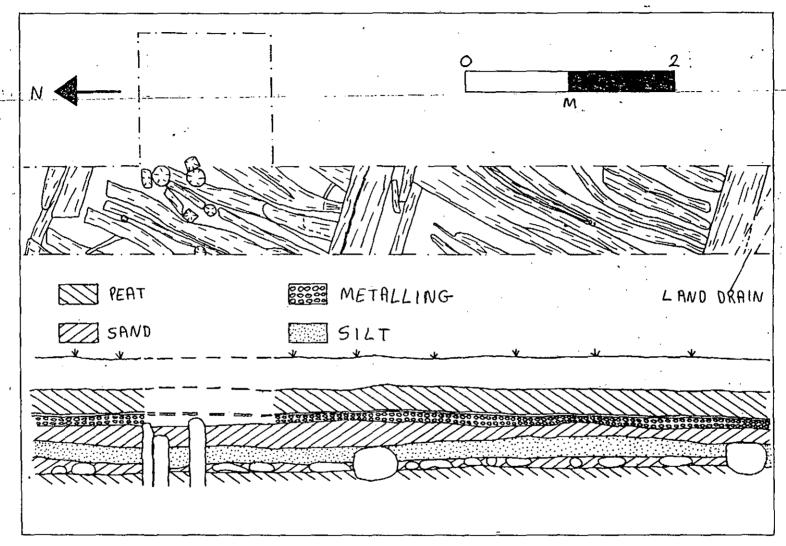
SCAFTWORTH 1991: PLAN AND EAST SECTION OF TIMBER CAUSEWAY
